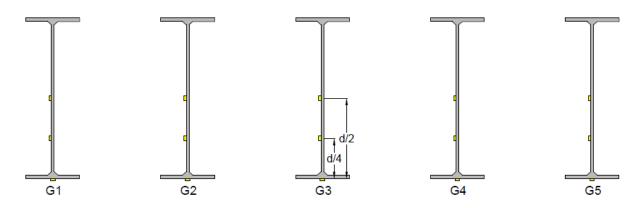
Gage Locations along Bridge Cross-Section (Looking North)
